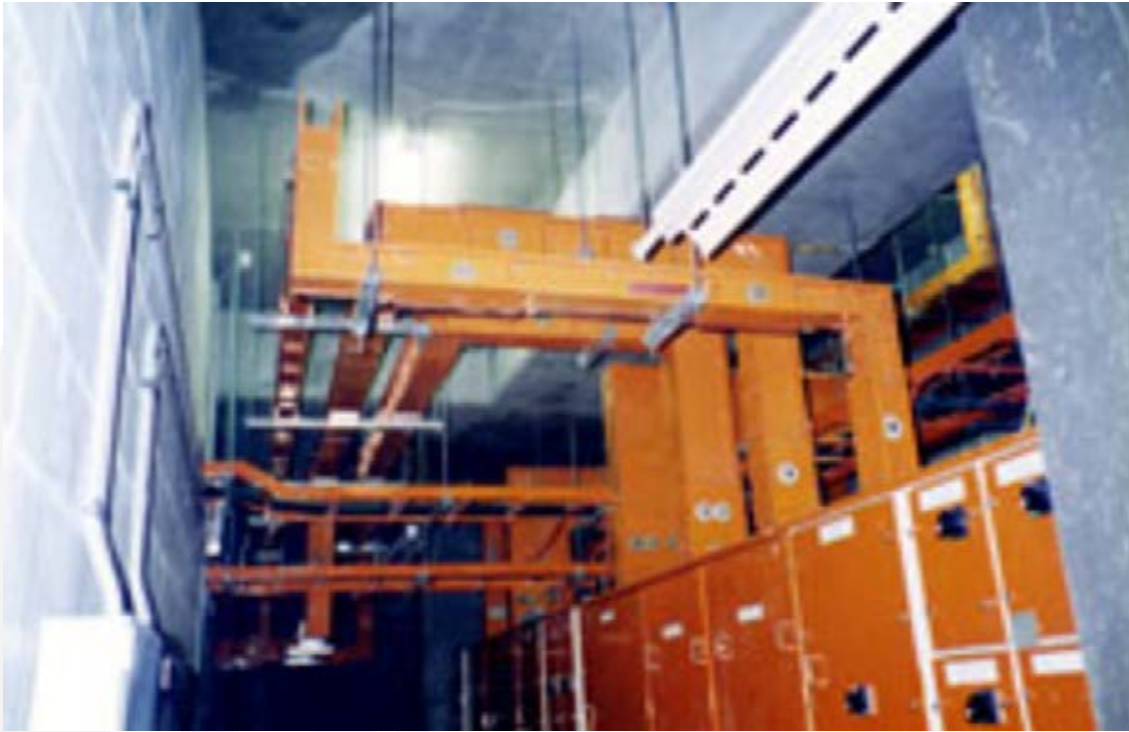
TYPICAL BUS DUCT SECTION WITH CENTER TAP FOR CABLE CONNECTIONS.
